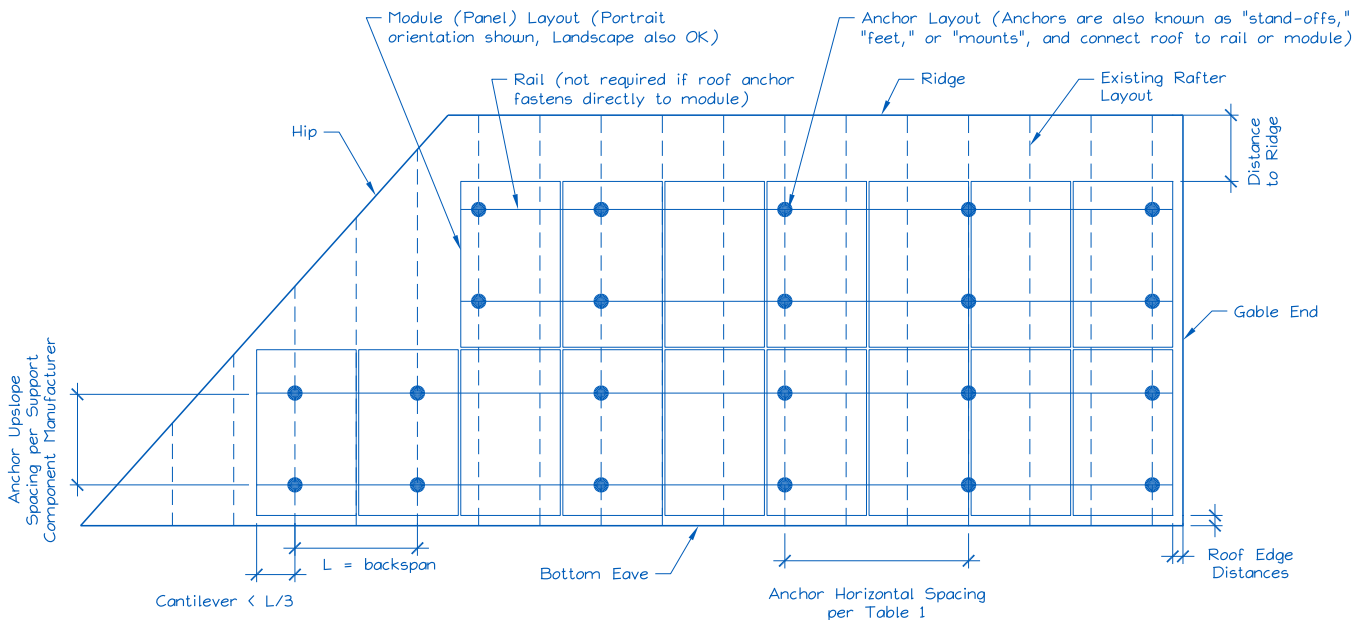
Sample Solar Panel Array and Anchor Layout Diagram (Roof Plan).
